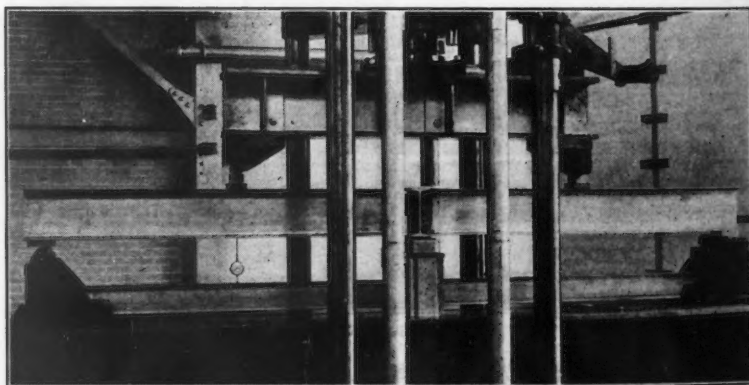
TWO-SPAN BEAM TEST OF SPECIMEN 4.
